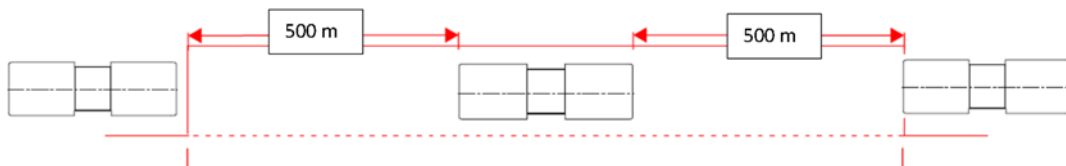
Longitudinal Cross Section Along Proposed Ventilation Arrangement
